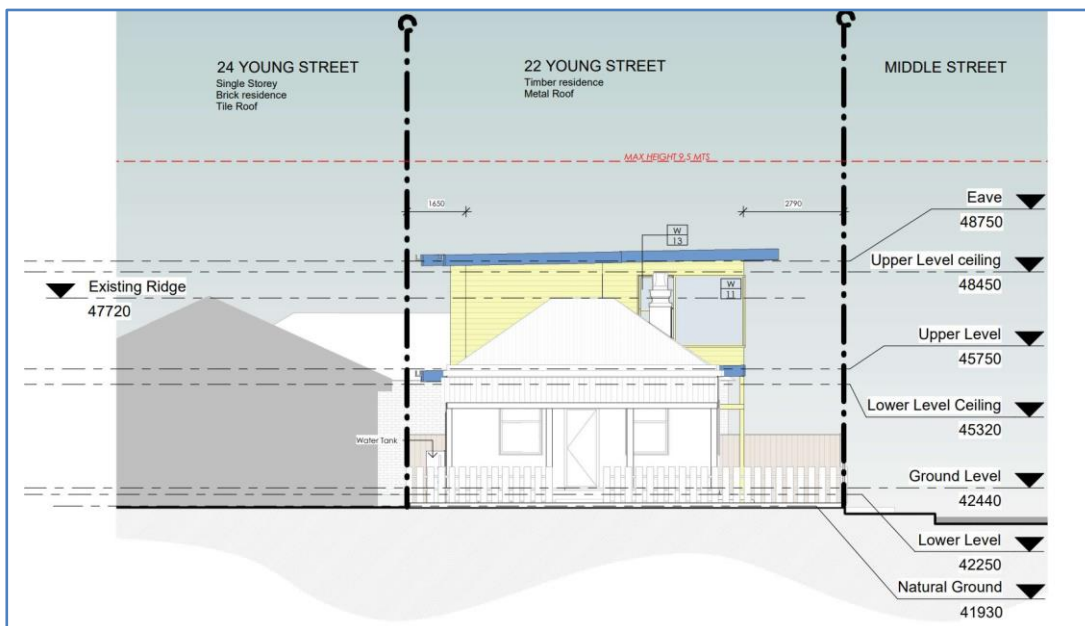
Proposed East Elevation. (Source: Bentley Design)
